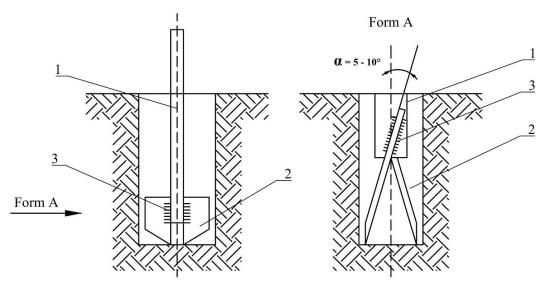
Dipping the equipment into the Soil 1 - barrel; 2 - pointed plates (thickness = 3-4 mm); 3 - welded joints
